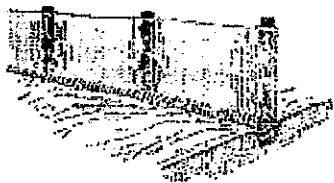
Constructing a silt fence to slow runoff and prevent erosion.
